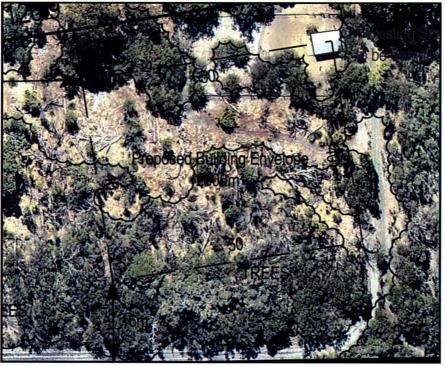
Extract of the proposed building envelope for Proposed Lot 2
